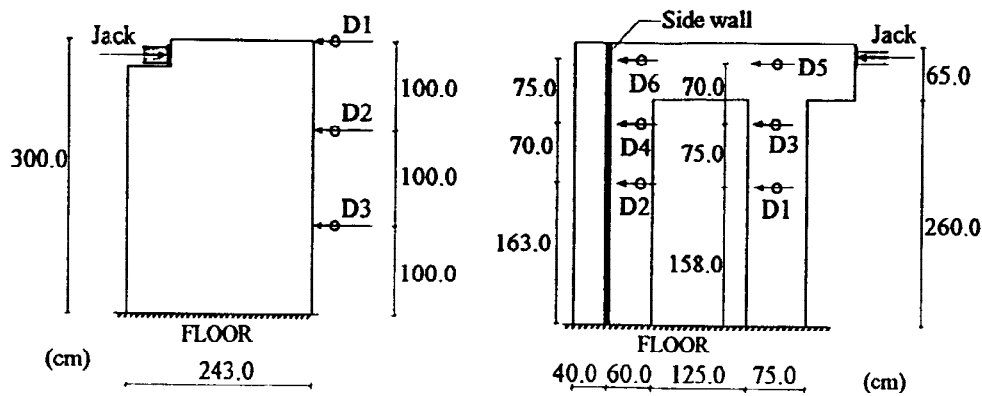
Tests 4 and 5 on the partition wood panels and test 6 on the facade
